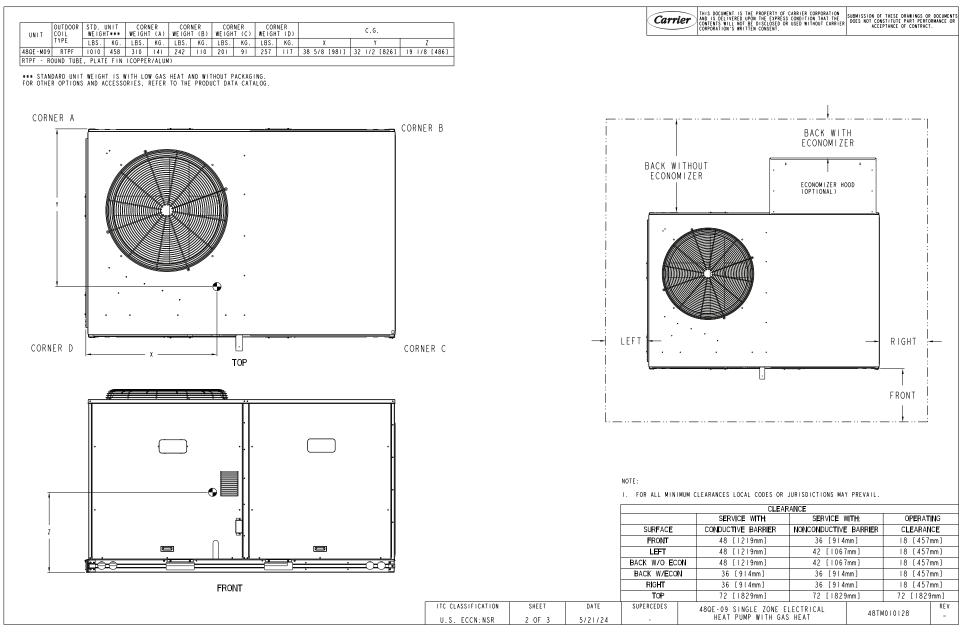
48QE 09 Unit Dimensional Drawing
